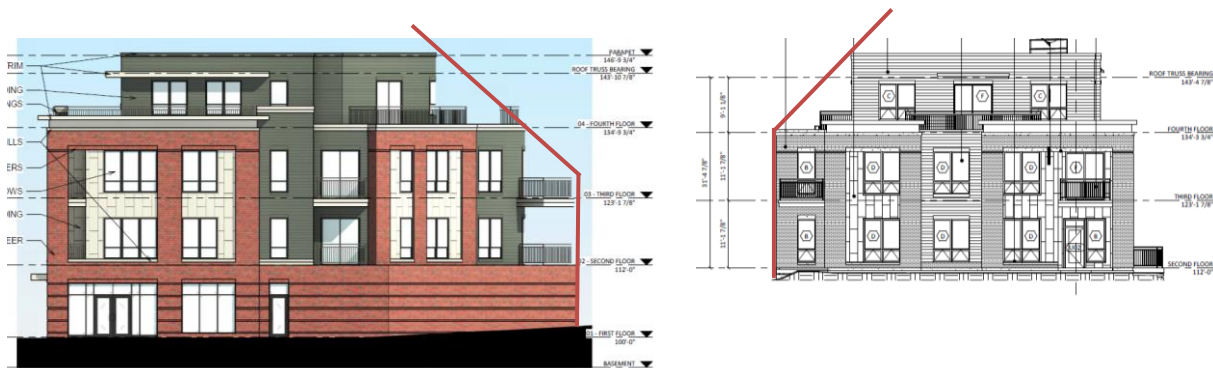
The Bulk Transition of the Proposed Building as seen on the Northeast Elevation (left) and West Elevation (right)
